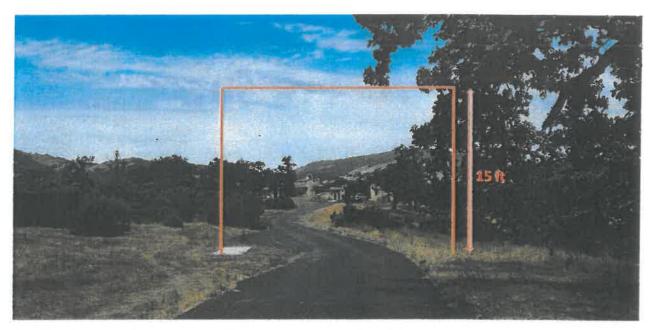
BE SURE TO CLEAR OVERHANGING BRANCHES ABOVE DRIVEWAY UP TO 15 FEET
